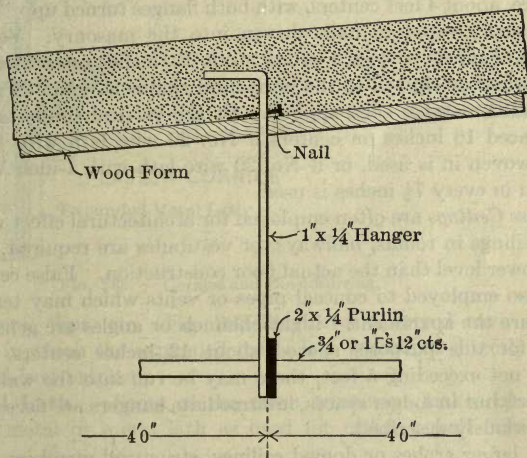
Suspended Ceiling Construction as used with Concrete Roofs.
